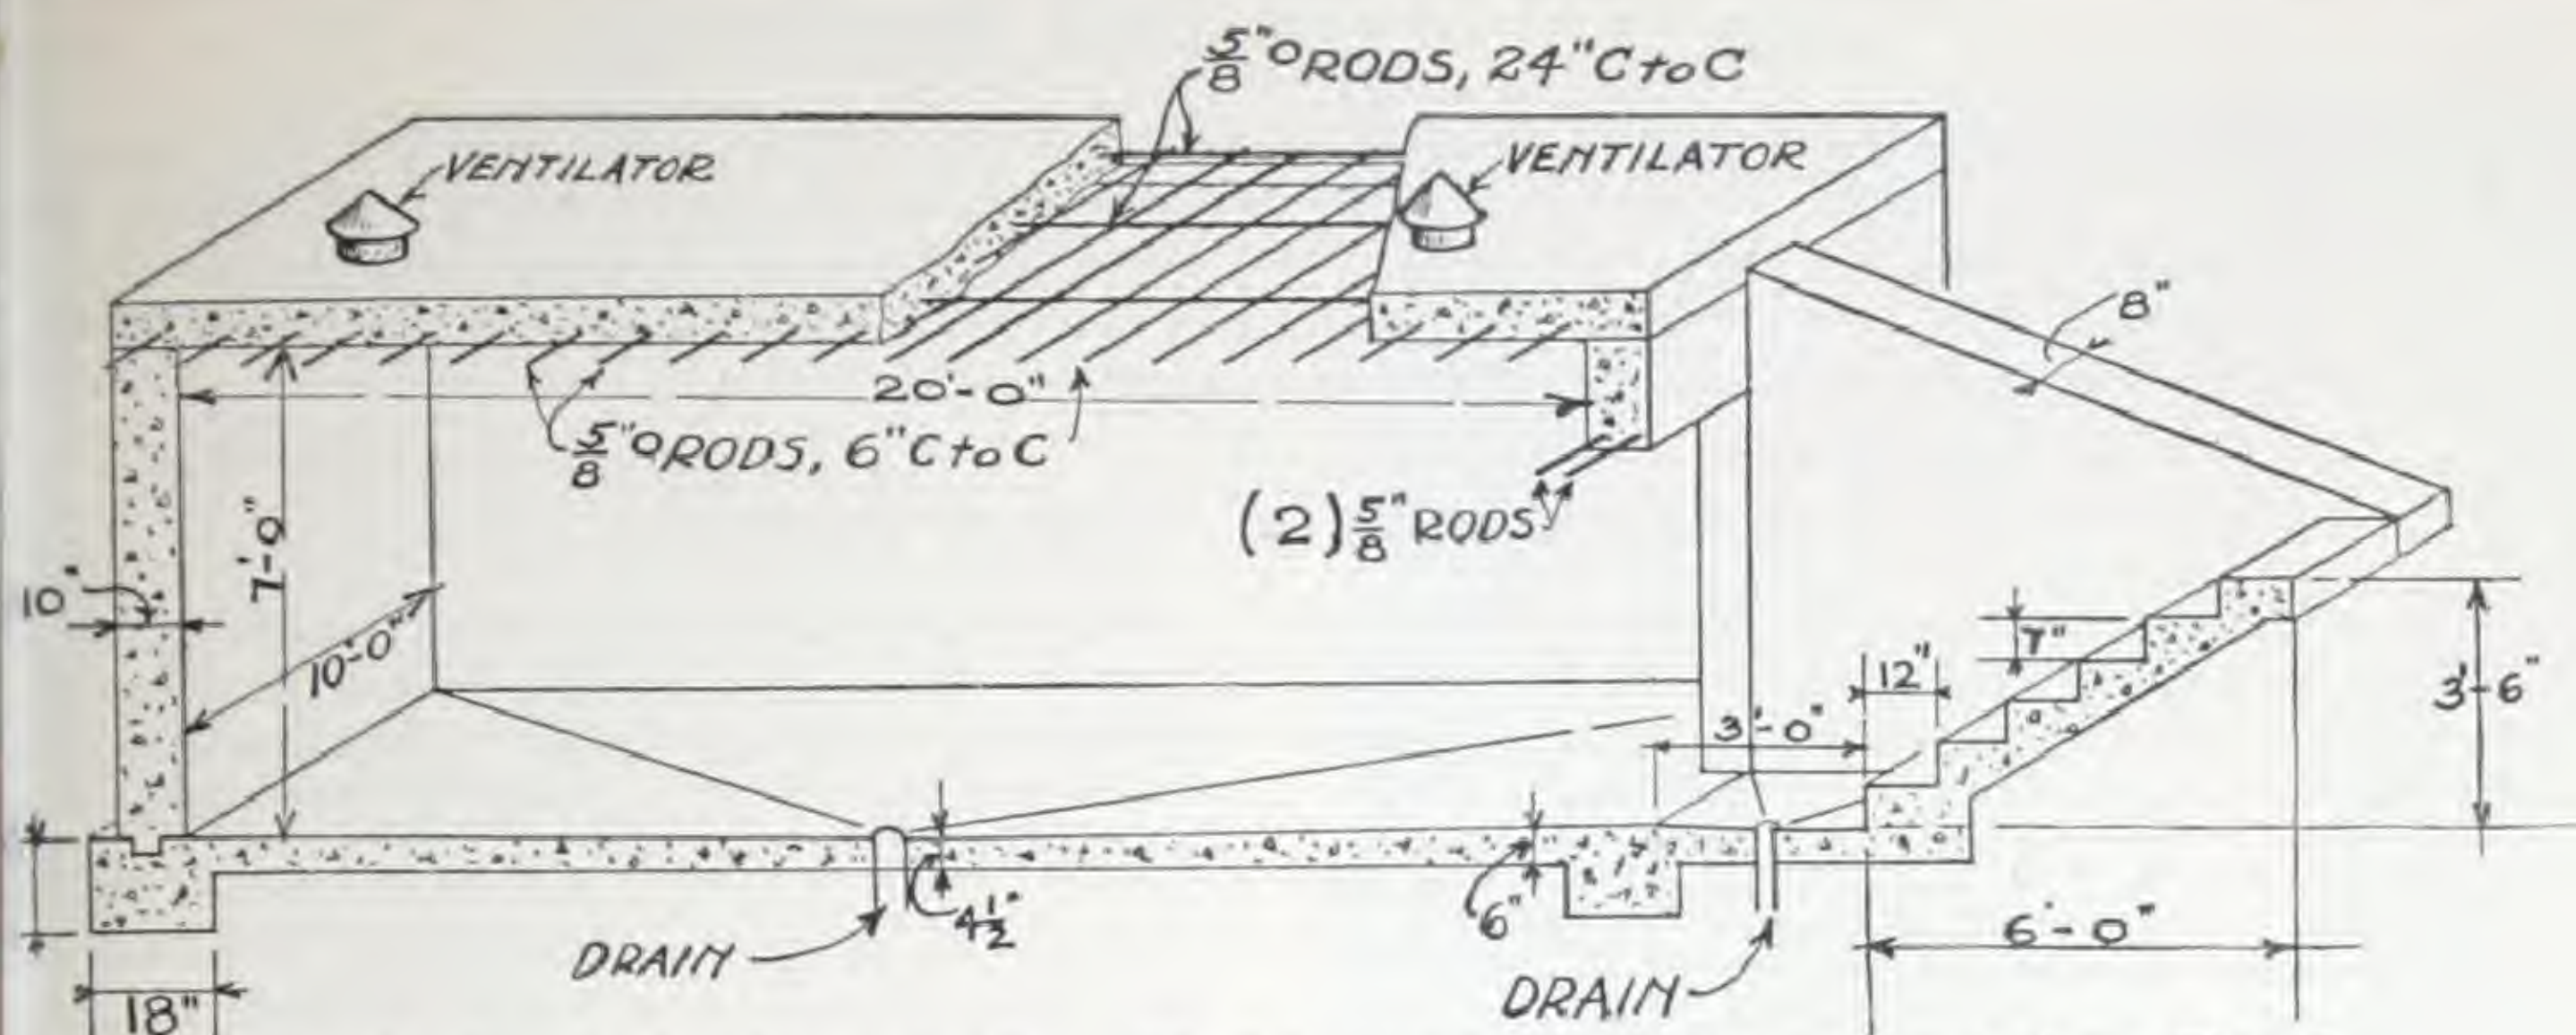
Detail plan for root cellar with flat concrete roof. For wooden roof see Fig. 35.
